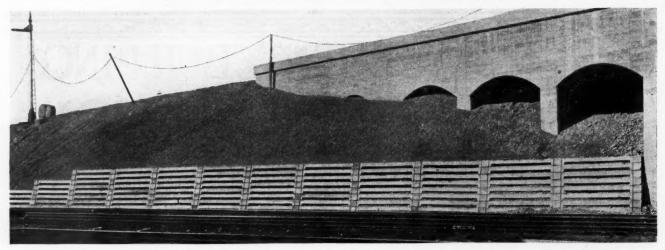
Concrete Cribbing Used as Retaining Wall Along Belt Line Railway, Near Seventy-ninth Street, South Chicago.
